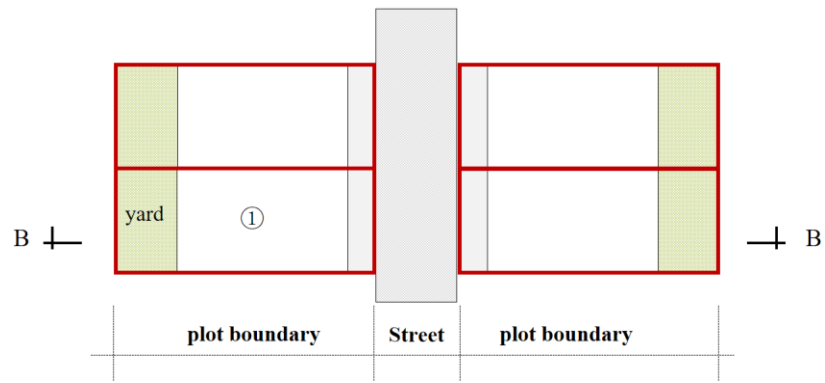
Plan diagram of Area 2 (Source: by the author)
